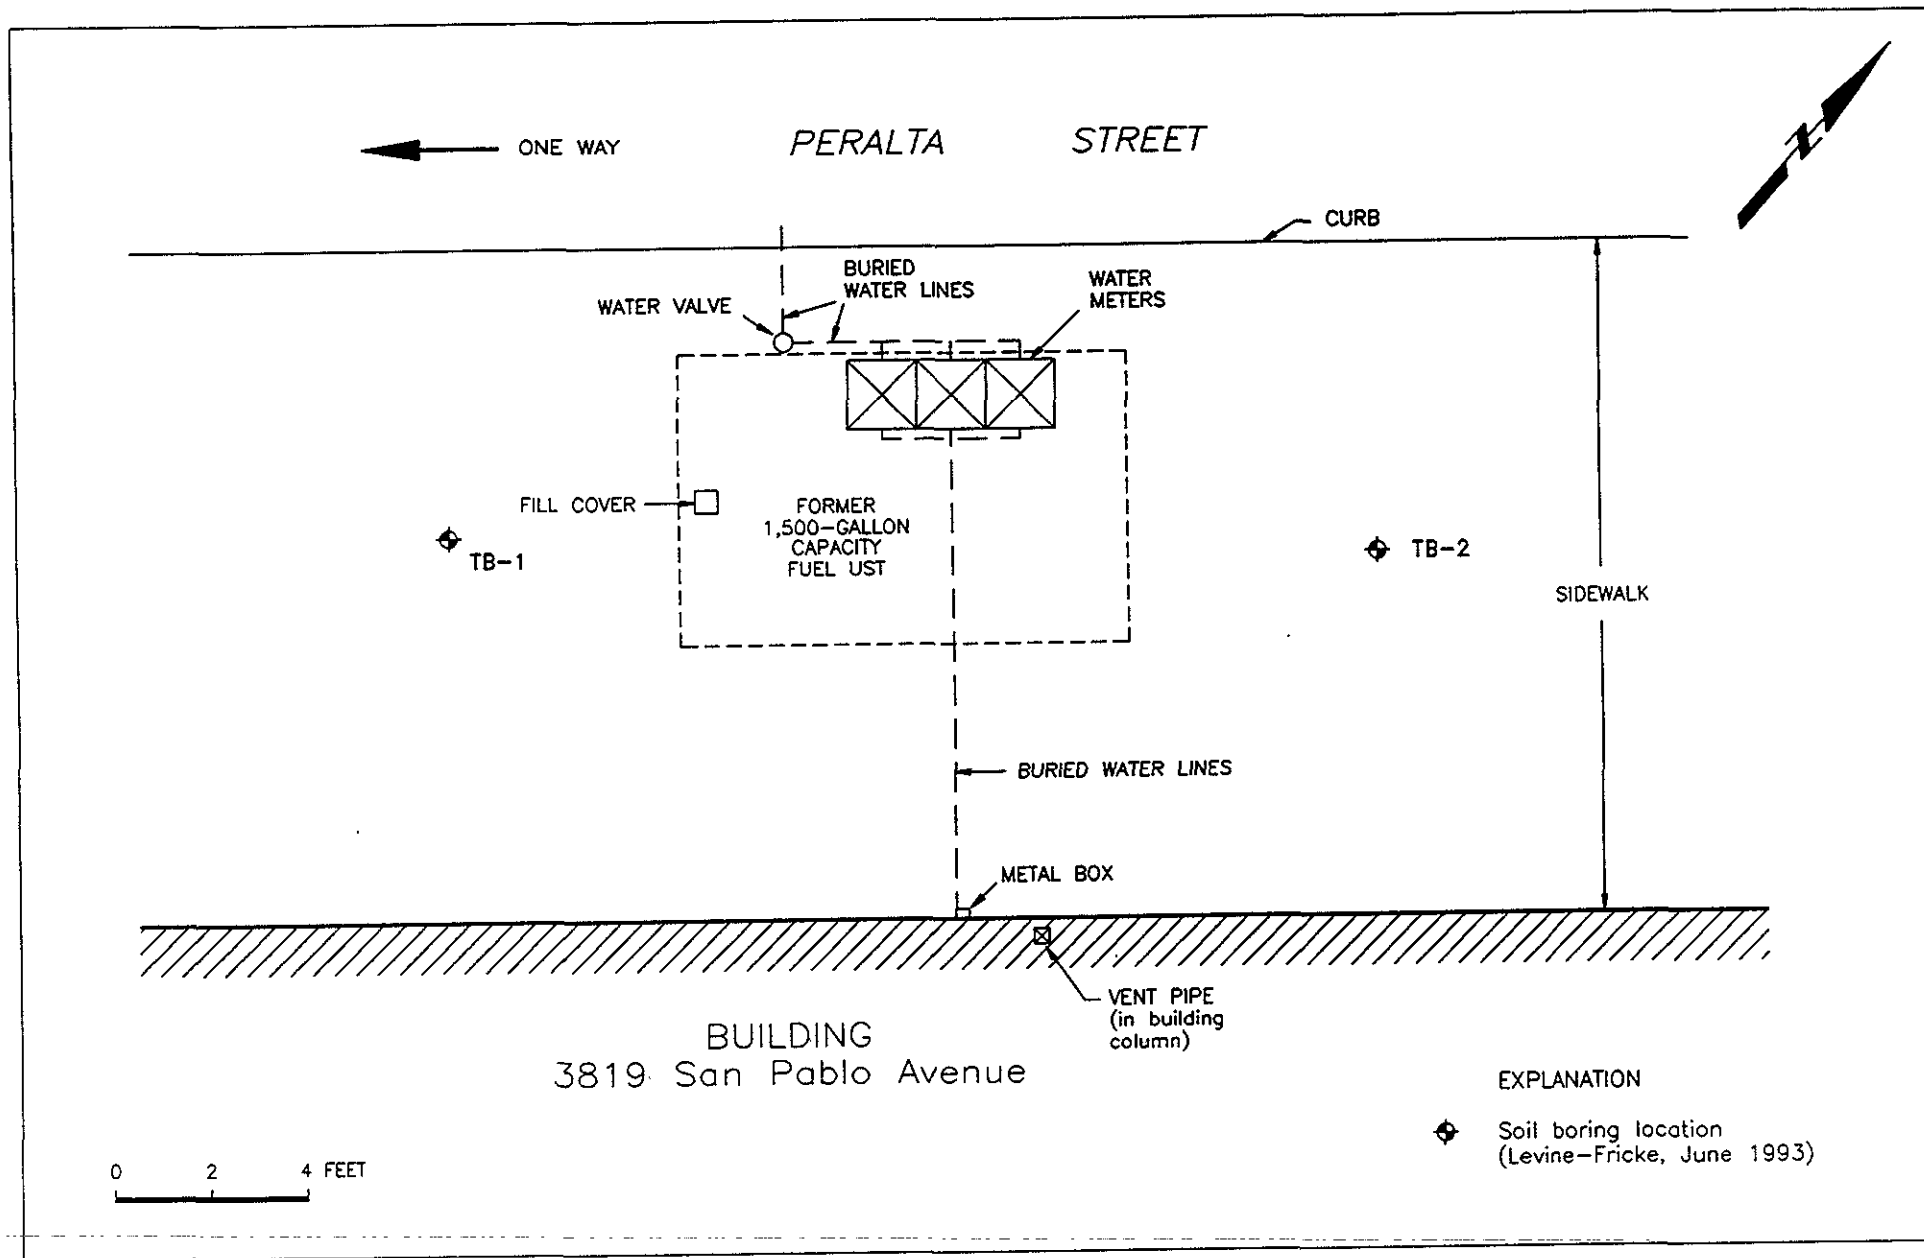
SITE PLAN SHOWING APPROXIMATE LOCATION OF THE FORMER UST AND SOIL BORING LOCATIONS
